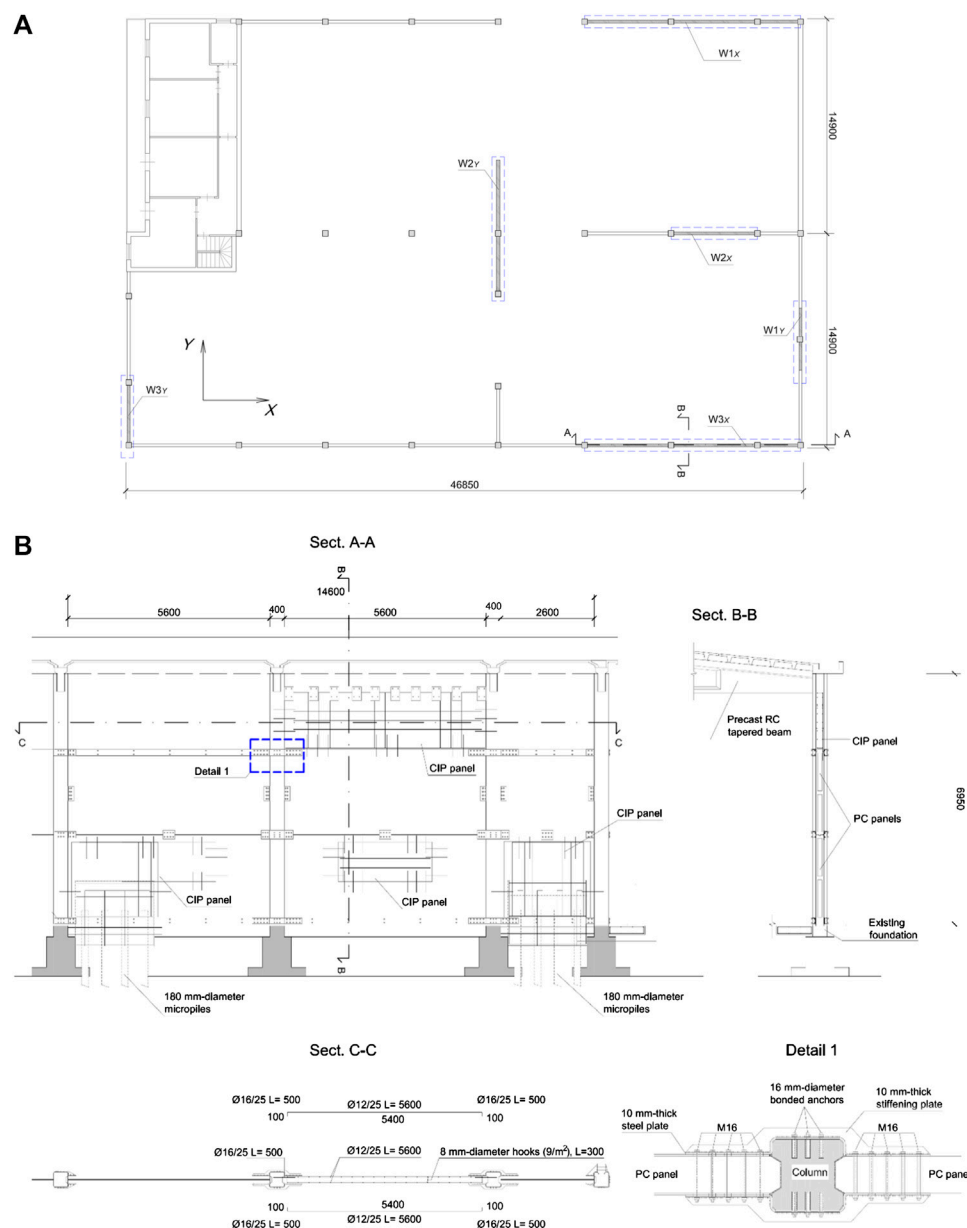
| RC cladding panels readapted as shear walls: (A) plan view of a building where three shear walls were obtained in both X and Y direction; (B) details for shear wall W_{3x} . Dimensions in mm.
